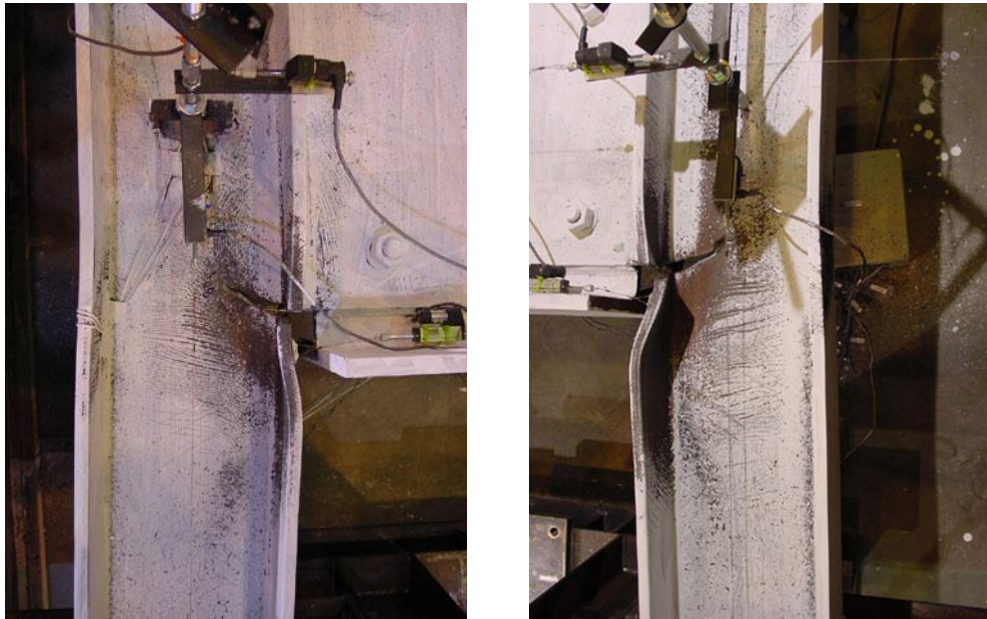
Beam-column connection failure (Uriz, 2005)
